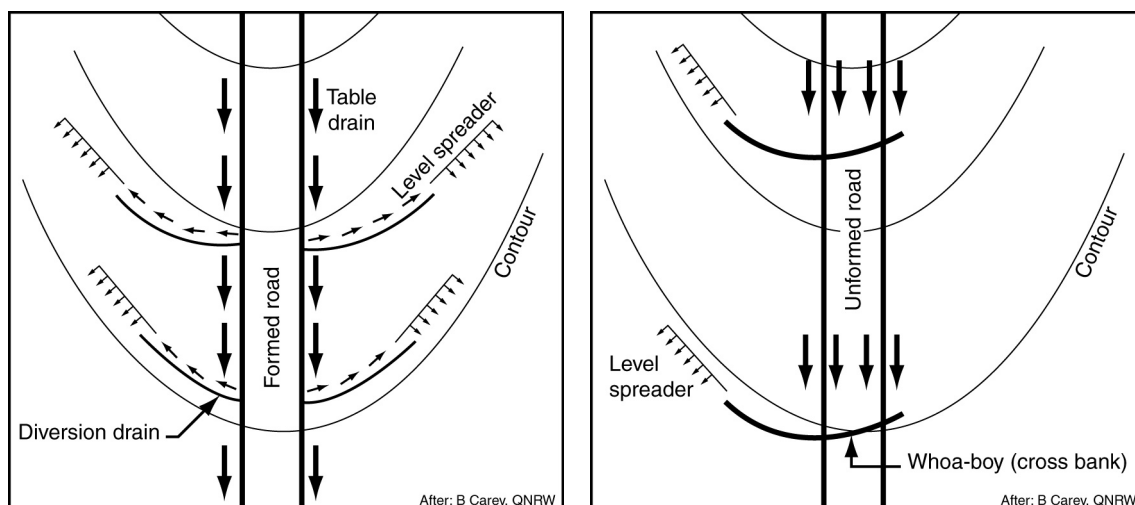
Drainage of formed and unformed roads on a ridge (Carey, 1992)
